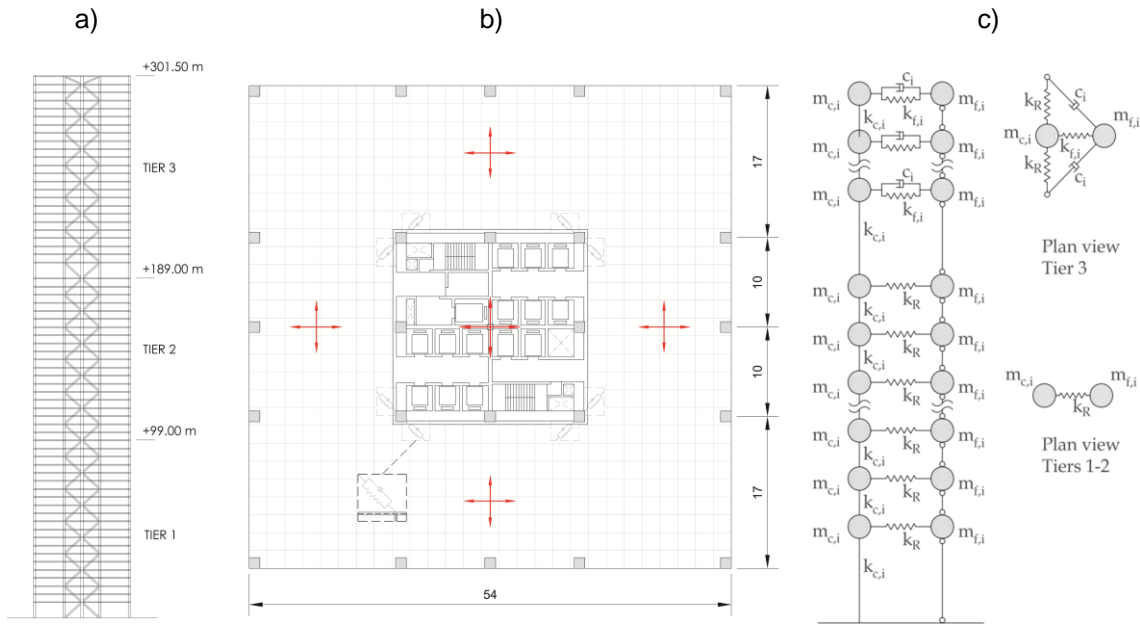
Case study building: a) Elevation view, b) Plan view, and c) simplified model
